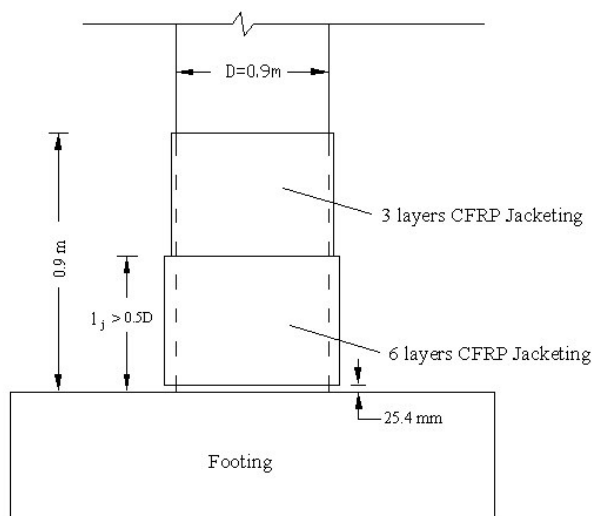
Retrofit Scheme for CFRP Pier Jacketing in MSC Bridge.
